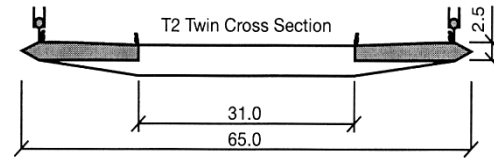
Section of Main Girder of Gibalatar Strait Bridge
